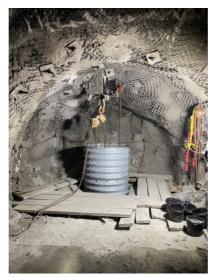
Steel liner column installation process, Andes Norte, El Teniente
